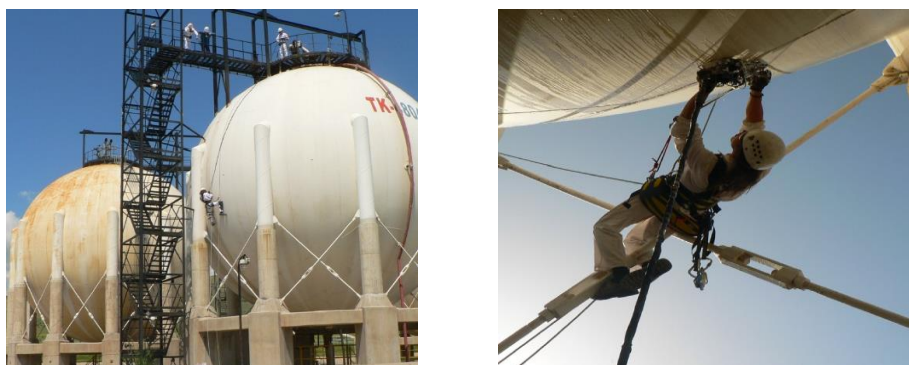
Petroleum storage tank inspection using abseiling technique [12].
